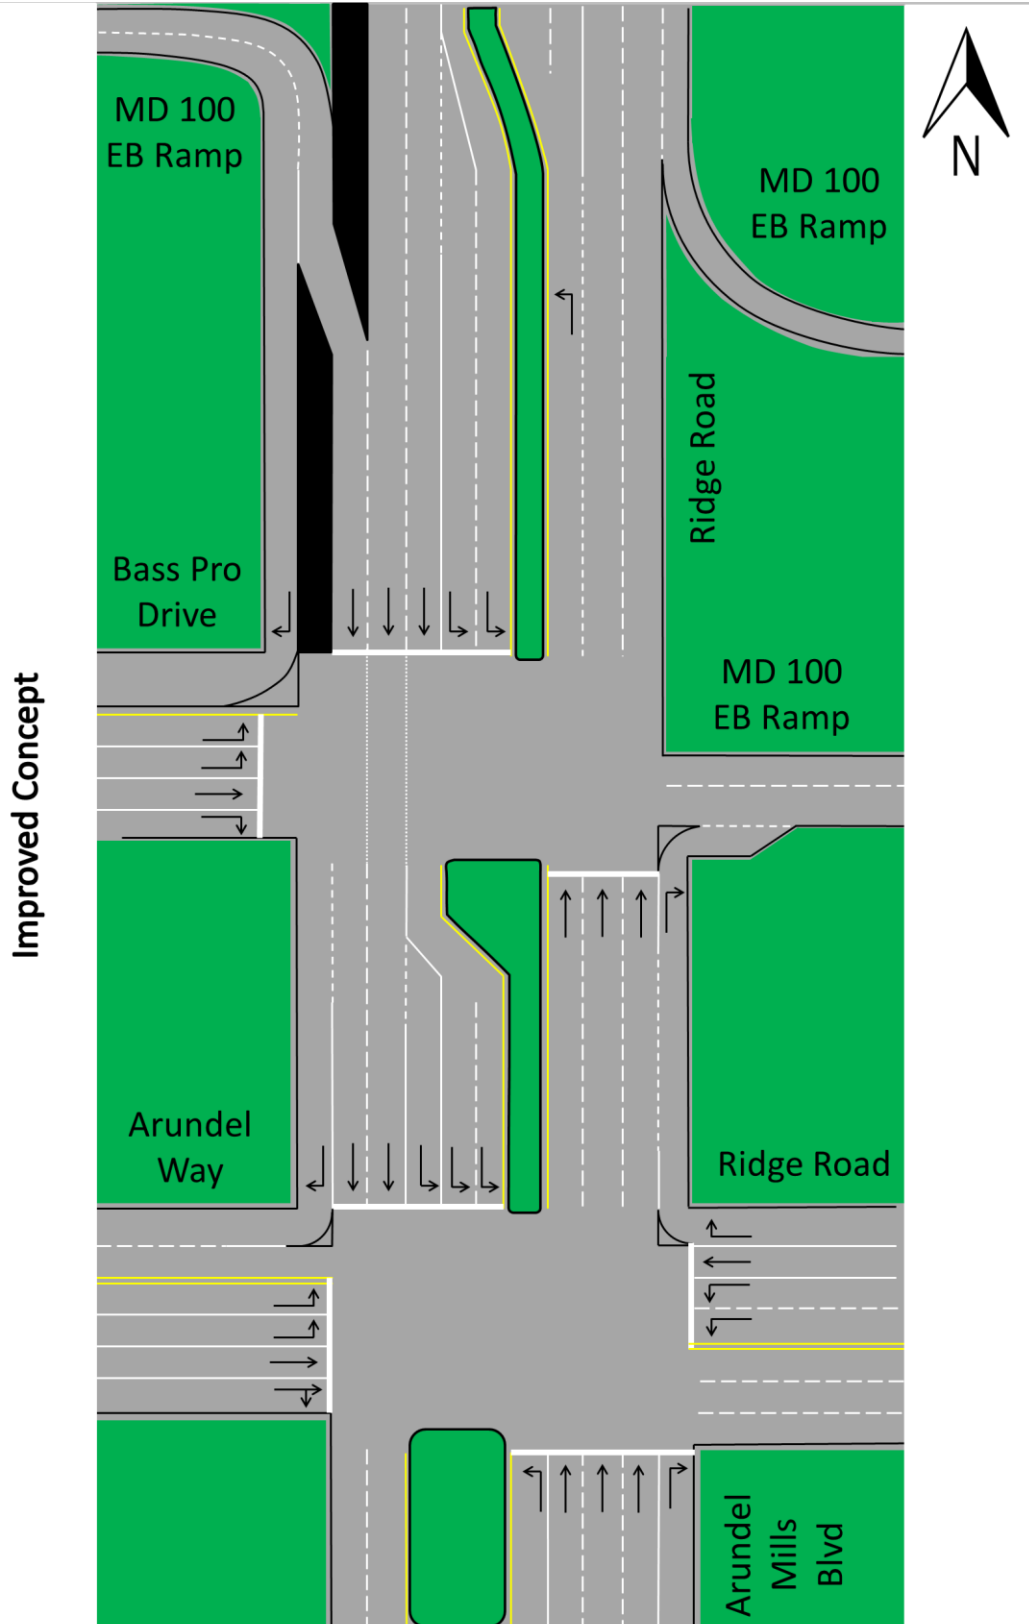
Improved Ridge Road at Arundel Mills Boulevard Weaving Section
